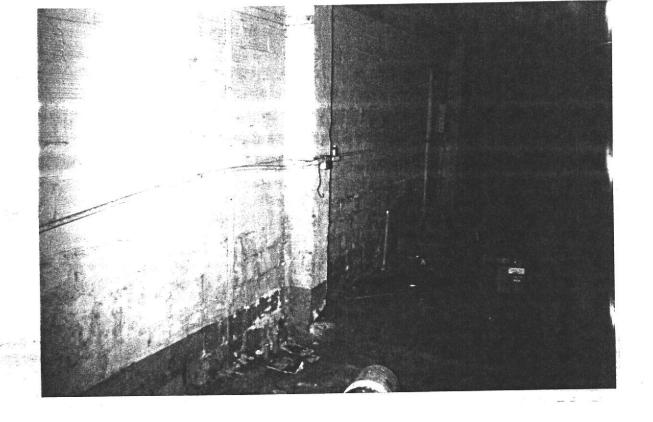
View of South Wall Facing Southwest 4525 Horton Street, Emeryville, California 14 October 1996
